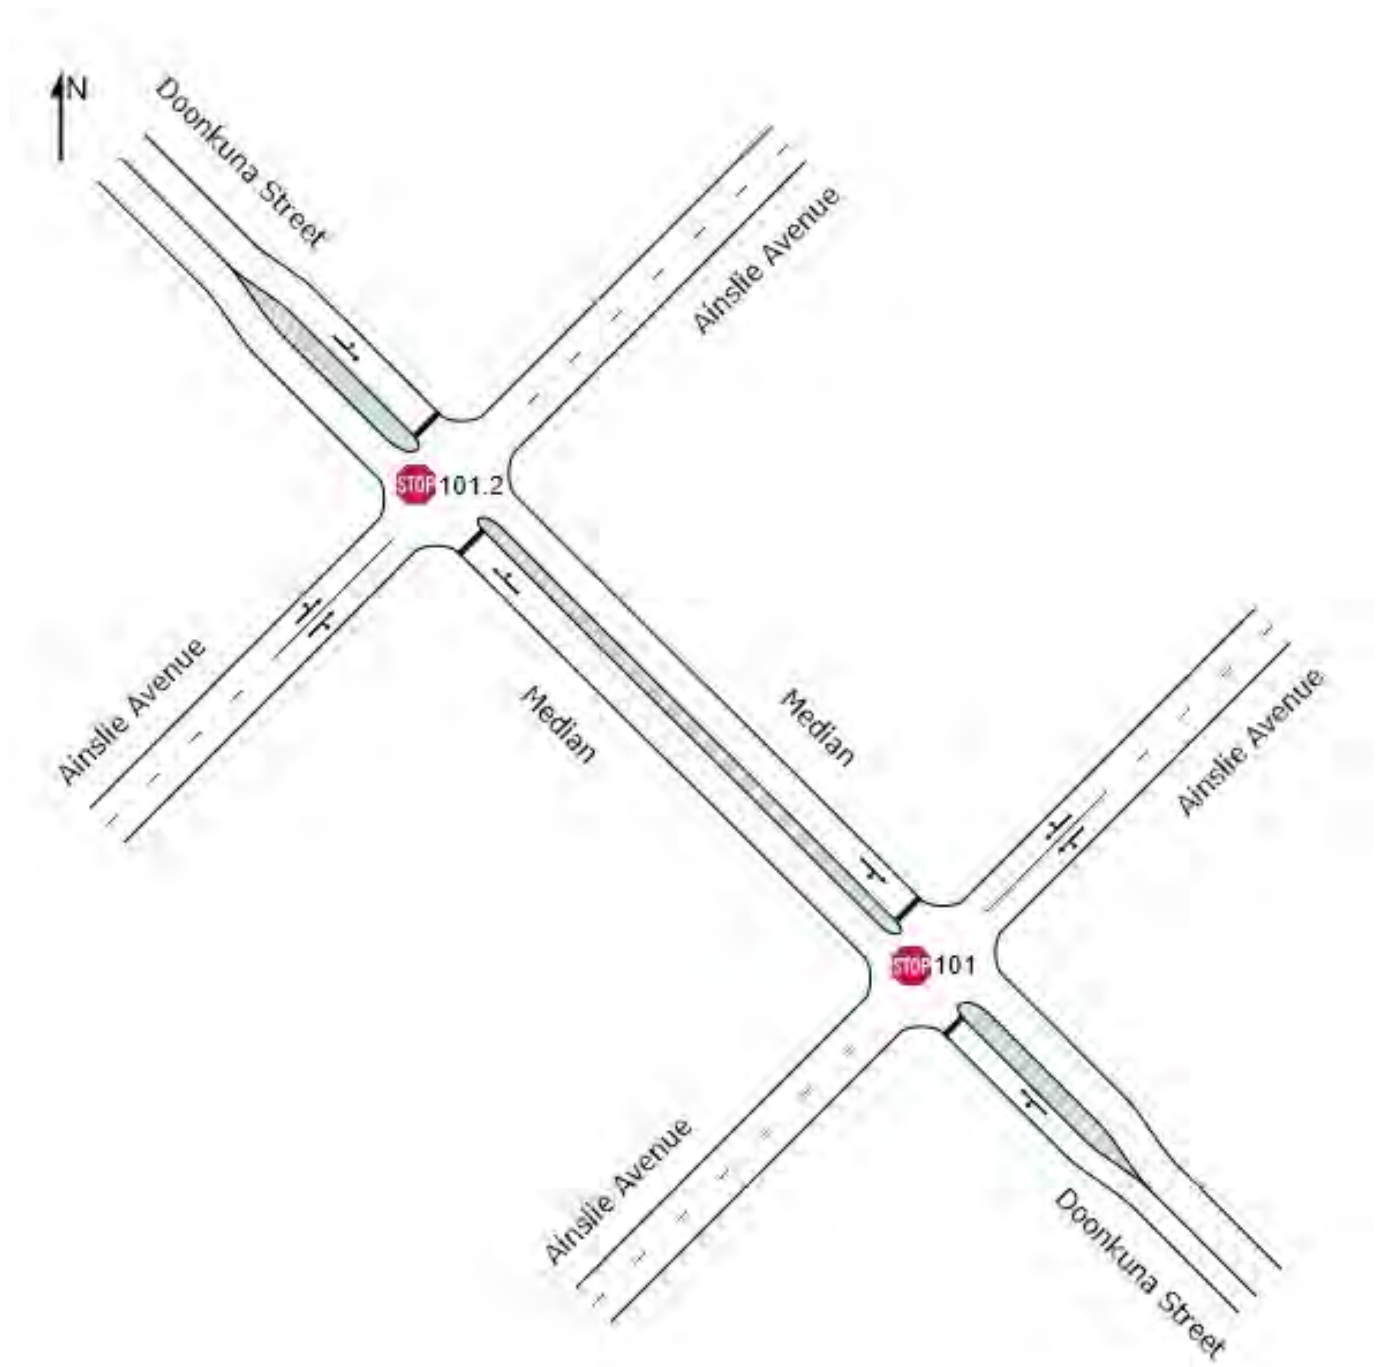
Current Intersection Layout – Ainslie Avenue / Doonkuna Street
